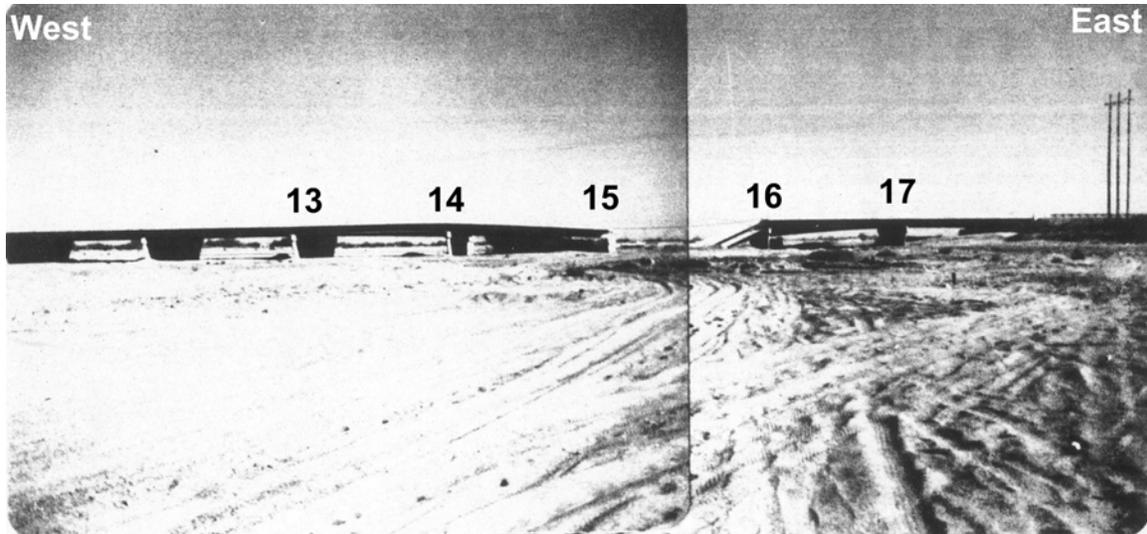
Photograph looking upstream at failed bridge after February 26<sup>th</sup>. Pier numbering indicated.
